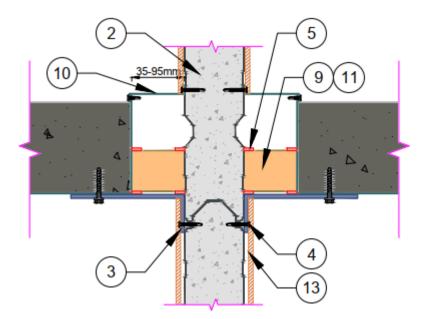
Dual wall system with vertical wall between horizontal walls – gap width of 35-95 mm between the stair and horizontally oriented wall
